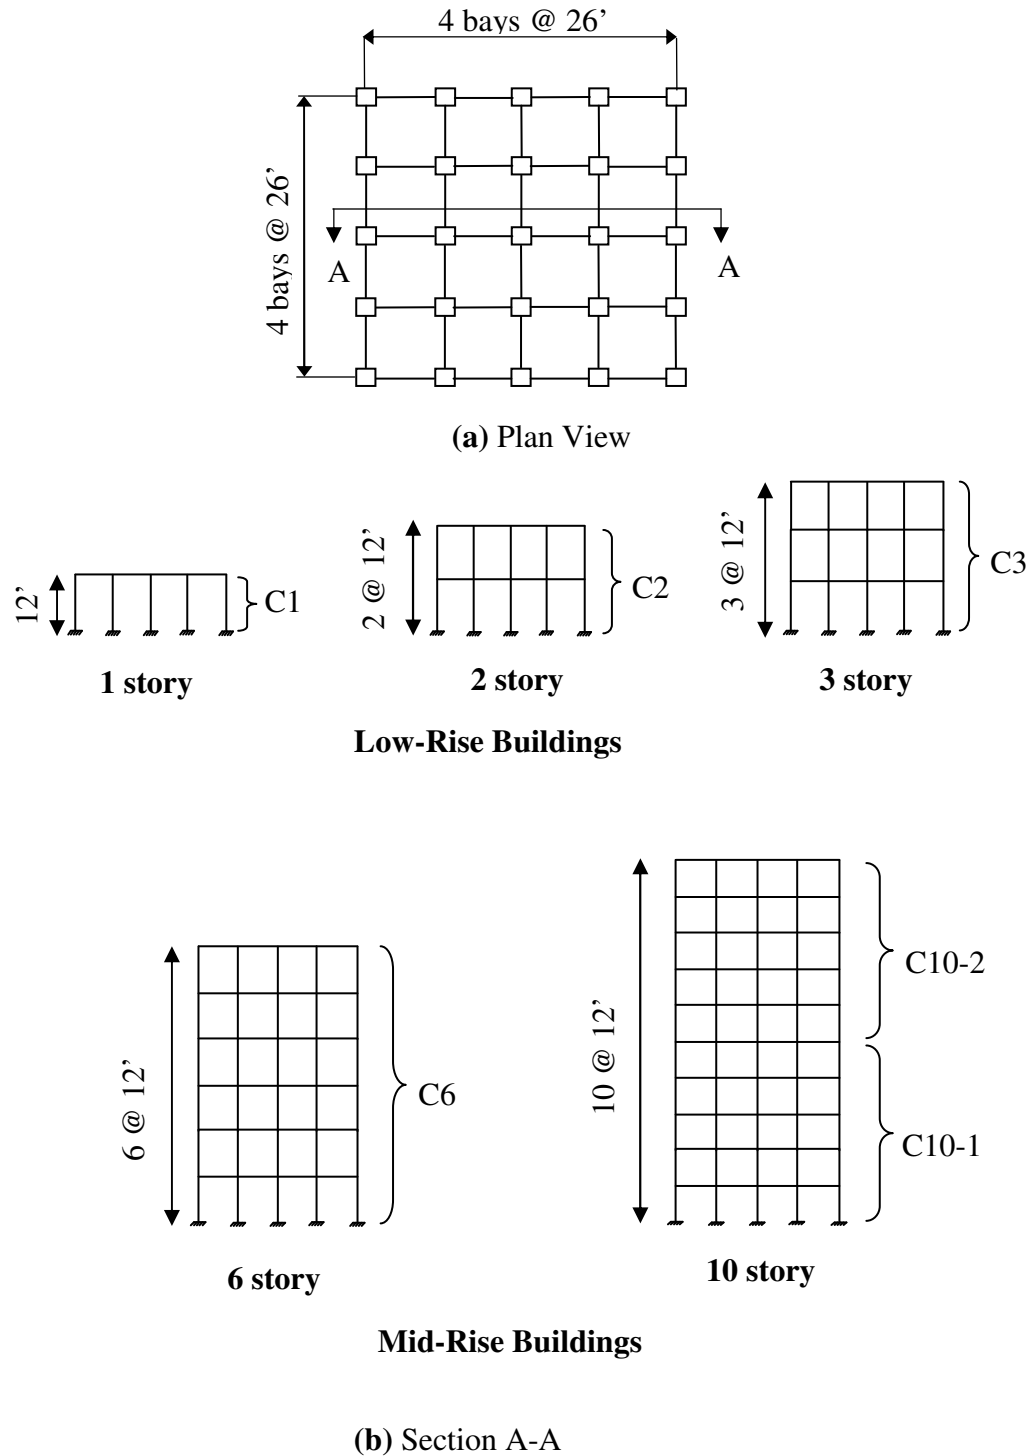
Plan and elevation of low- and mid-rise GLD RC frame buildings
